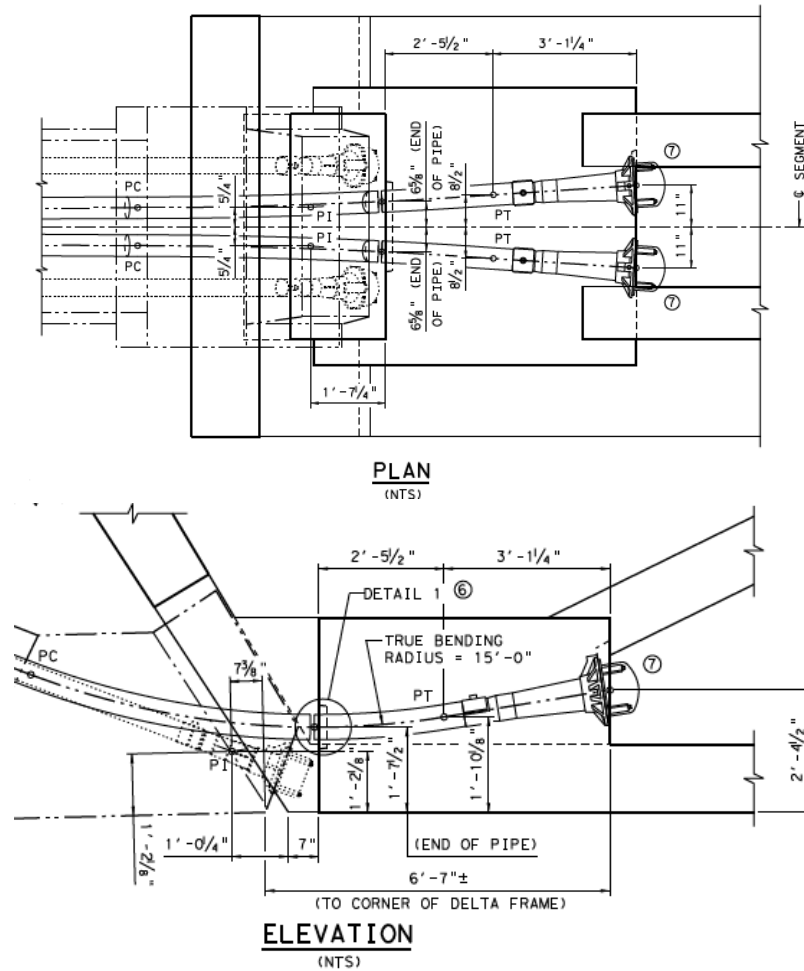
Delta Frame Tendon DT2 & DT3 Anchor Block Details (SB Shown, NB Similar) – Schematics by Others
